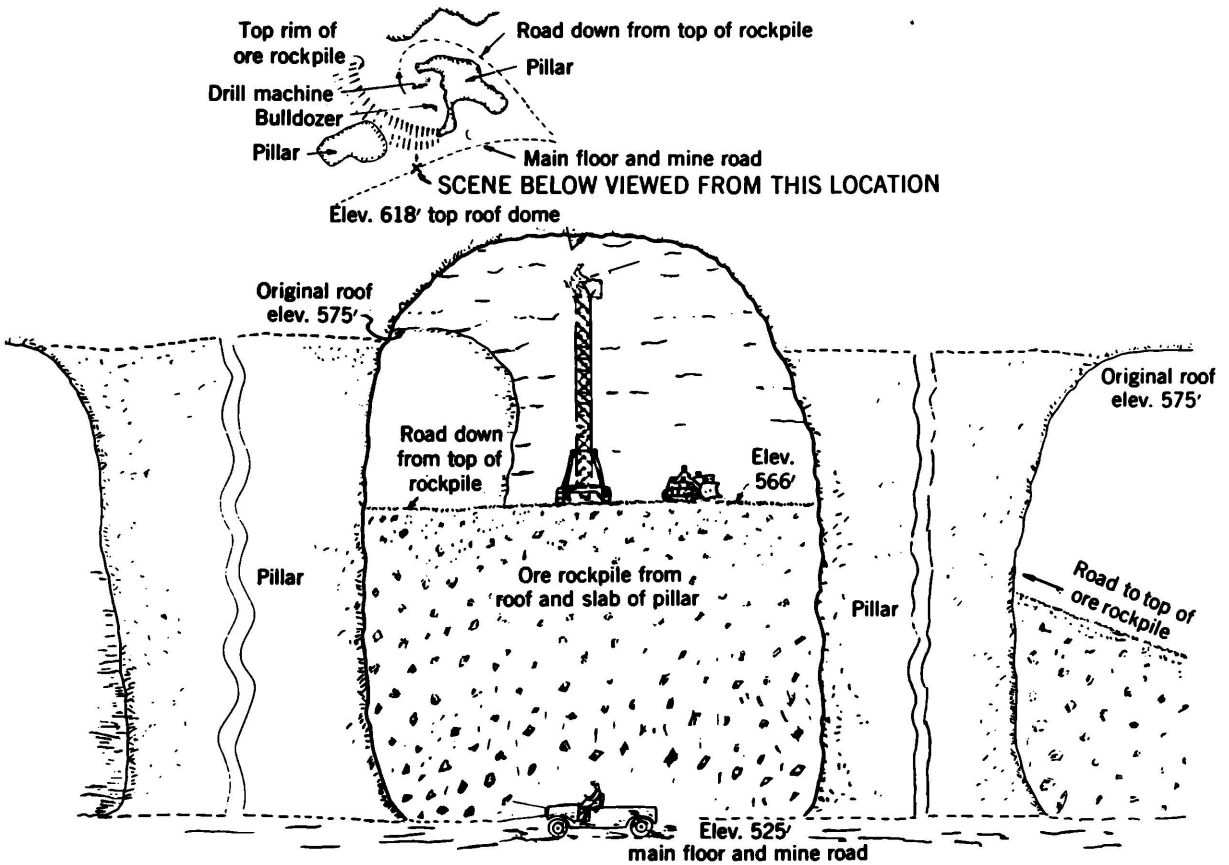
Drilling in Stopes, Room and Pillar.
